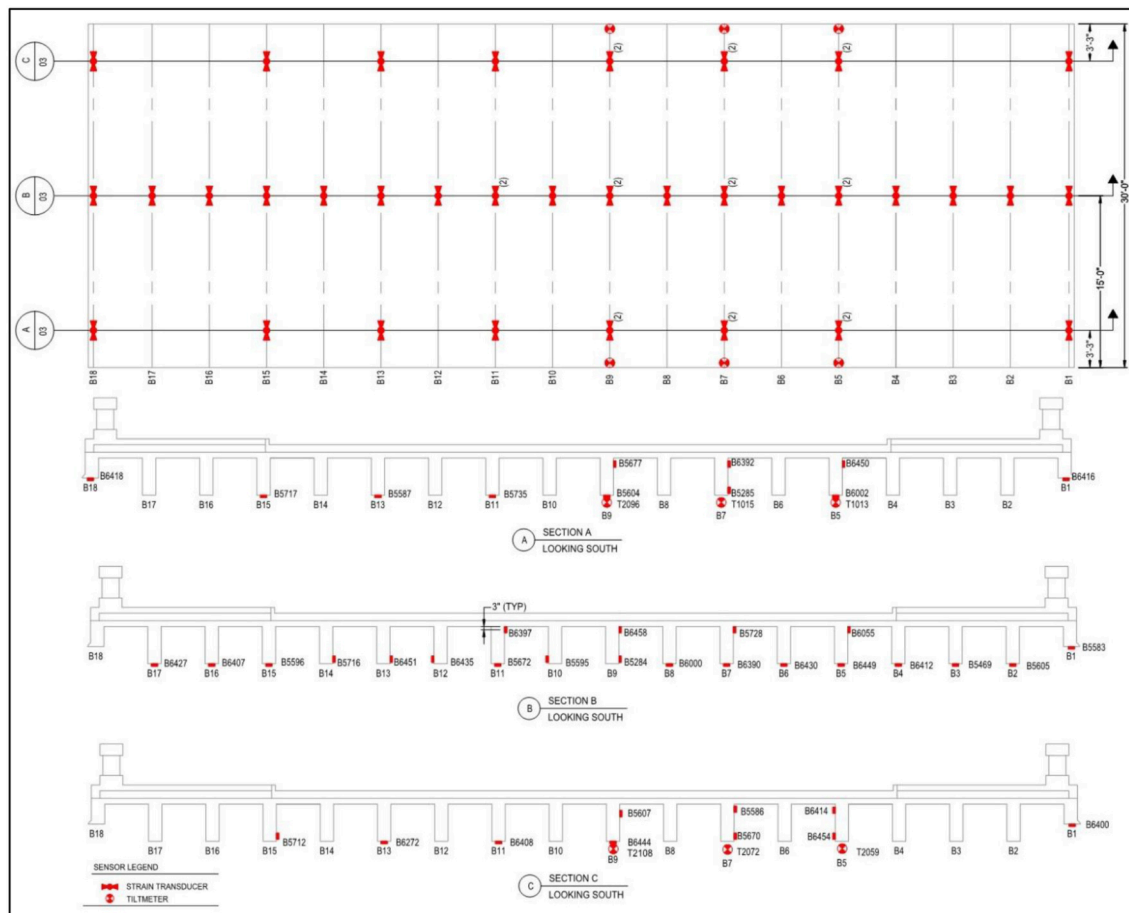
| Instrumentation plan for a multi-beam RC T-Beam bridge.
